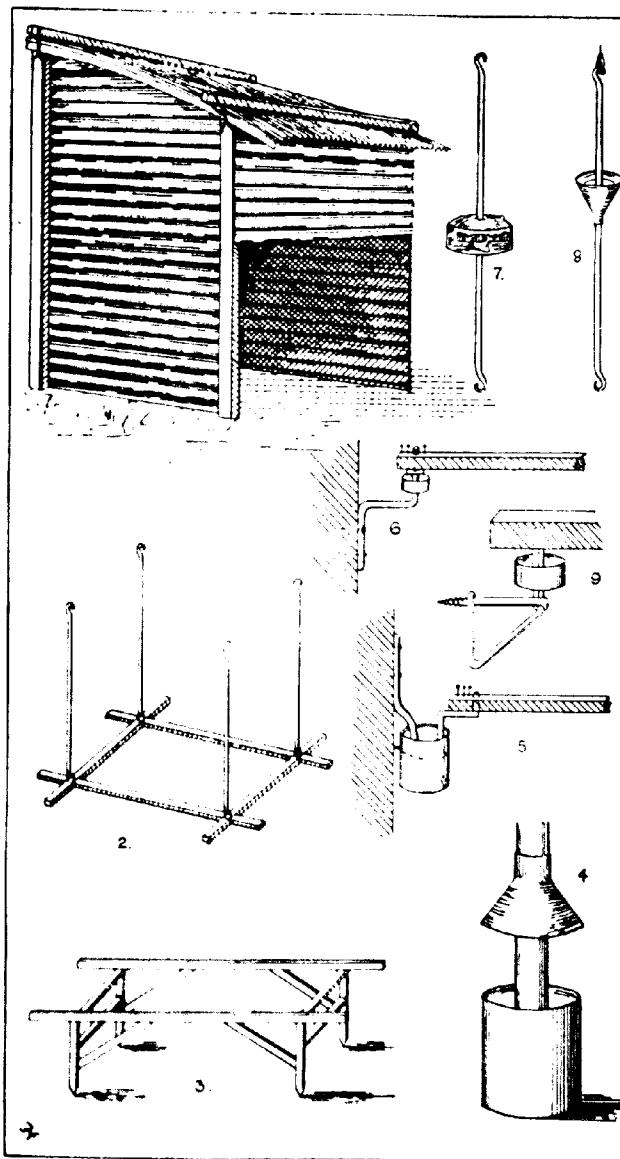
1. Tick-proof Fowl House with woodwork outside. 2. One level roost to show how supported by rods or wires. 3. One level roost supported from floor. 4. Suggestion for insulating leg of No. 3. 5 and 6. Methods of insulating roosts by tick proof wall brackets. 7 and 8. Insulation devices for rods and wires; in 7 which is dust-proof (figured with part of side cut away to show oil furrow) the oil is poured in through the aperture at the top. 9. Tick-proof roost bracket procurable from dealers in poultry supplies. (After Lounsbury.)
